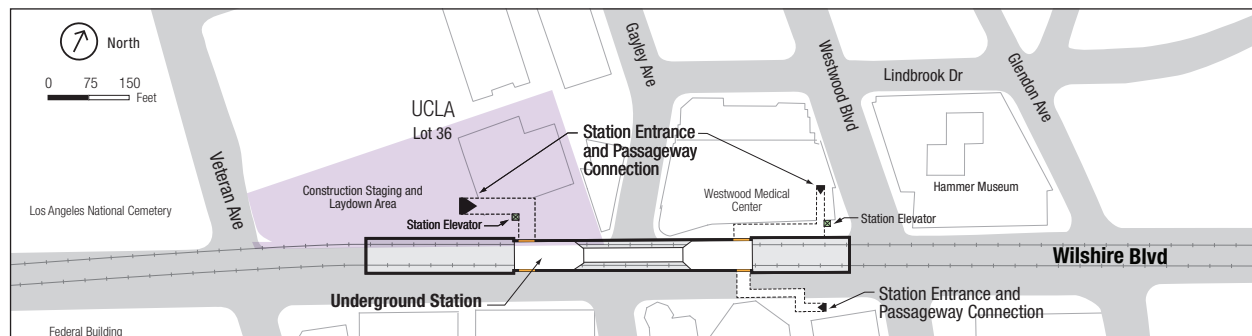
Westwood/UCLA On-Street Station (recommended)
